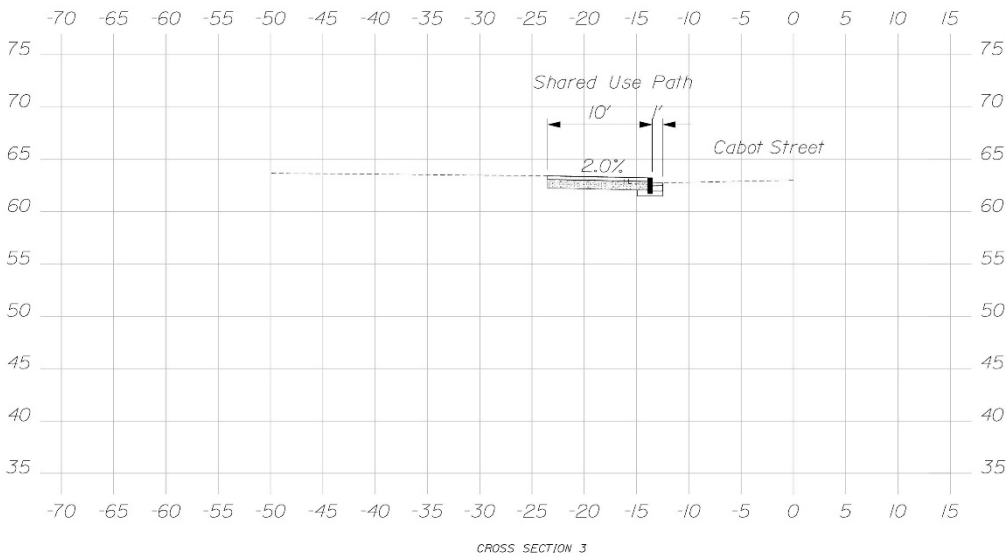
Alternative 2 Cabot St. Cross-Section
